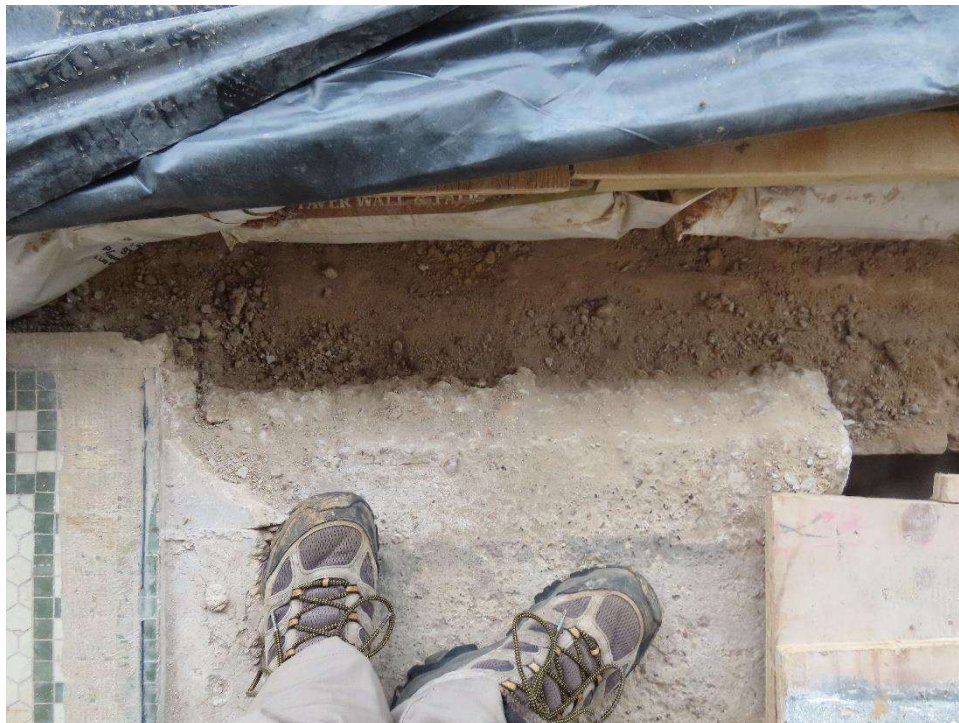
View showing the distinction between the sidewalk base and the top of the grade beam.
